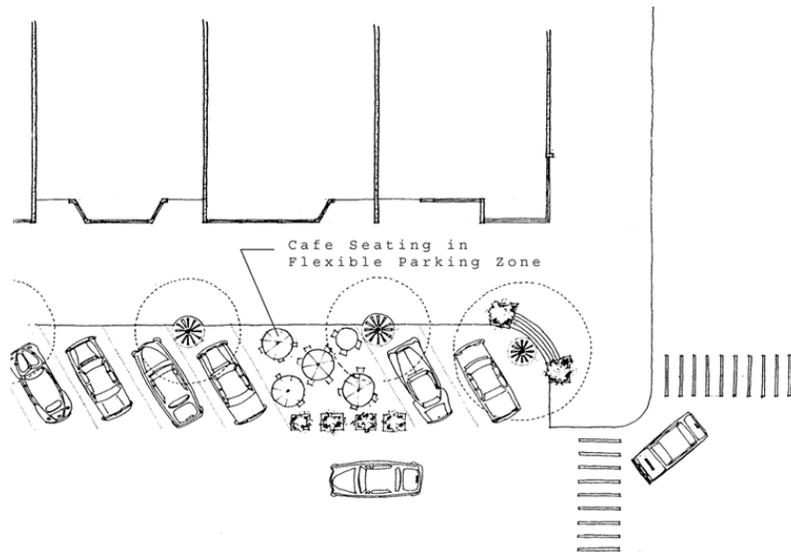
Typical Bulb Out and Flexible Parking Zone
